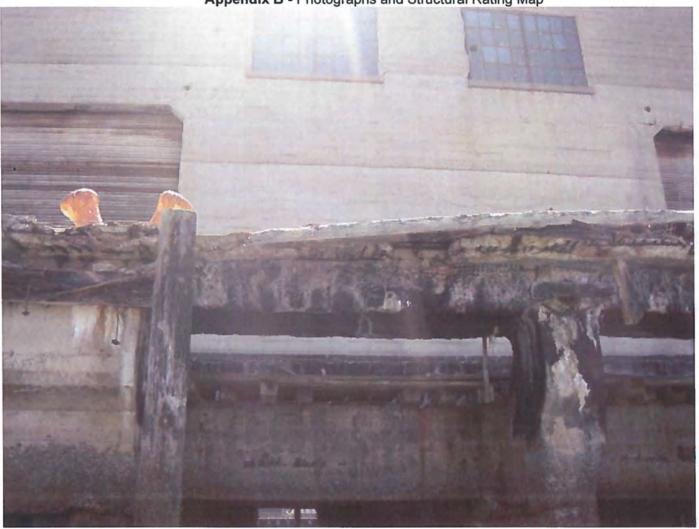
Spalling deck and corroded/exposed rebar
